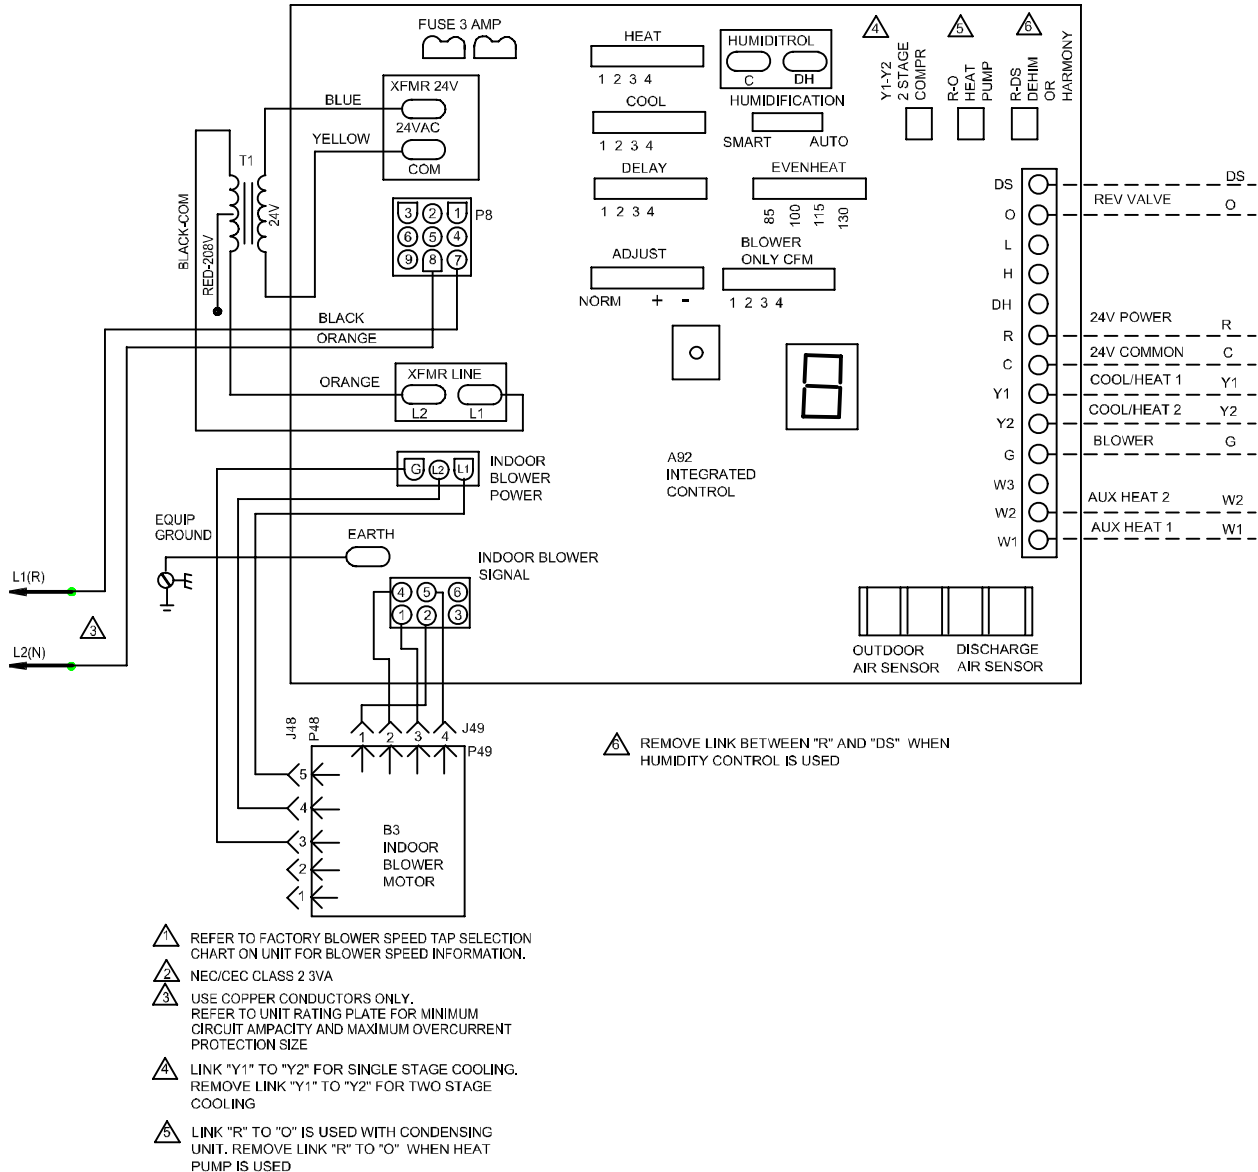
CBX40UHV Air Handler Unit Typical Wiring Diagram
